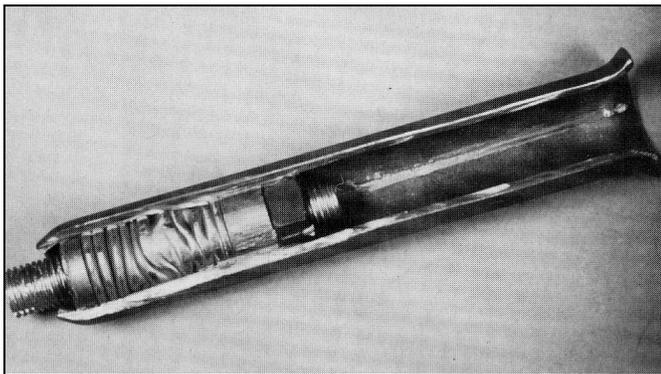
Cross-sectional profile of a bolt head with buckling tube from Ingenieure Mayreder, Kraus Co. [5].
